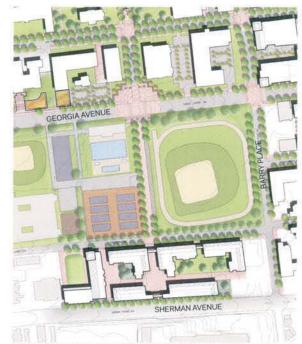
Plan view of proposed Gateway at Howard Place and Georgia Avenue
